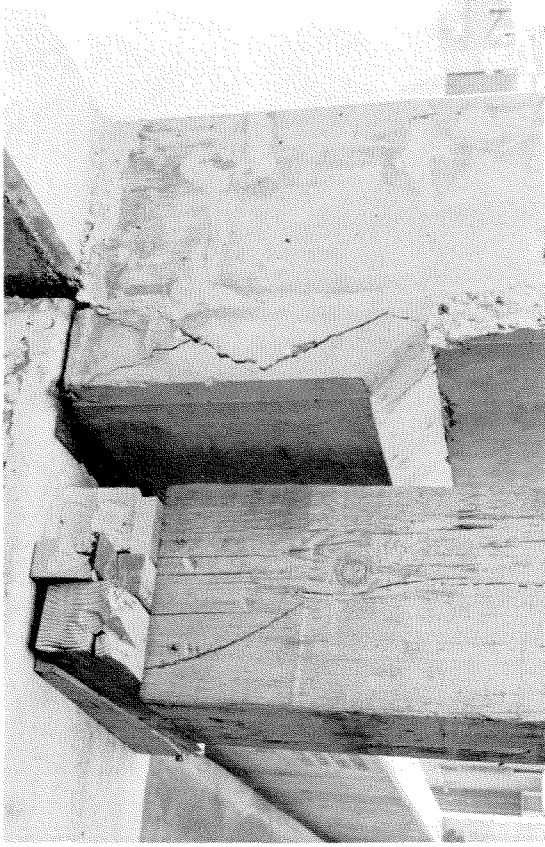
152 The cracks in the exterior column of the Union Bank parking structure were probably caused by horizontal movements of the overhead beam.
